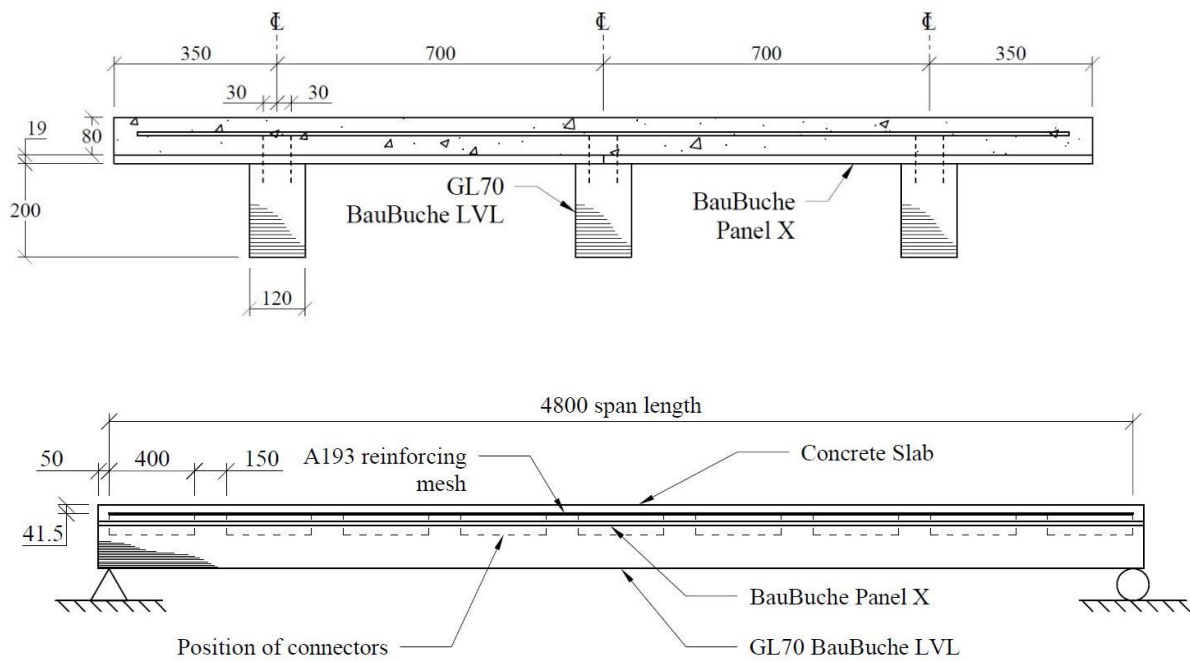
(a) Cross-section, and (b) side elevation of full-scale experimental specimen
